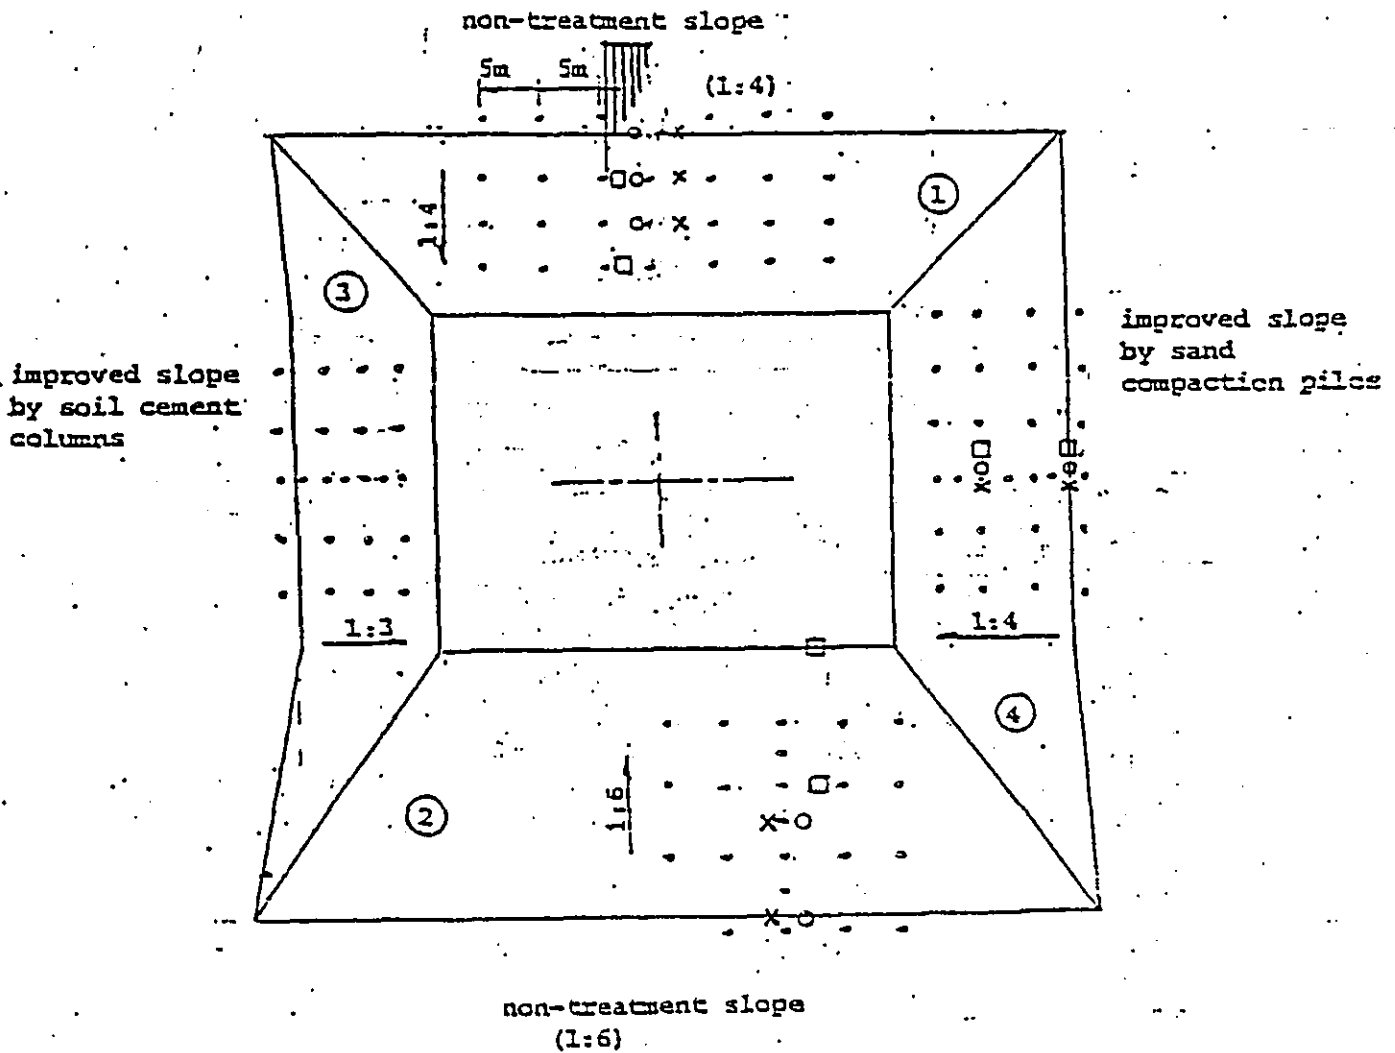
PLAN OF MEASURING INSTRUMENTS
